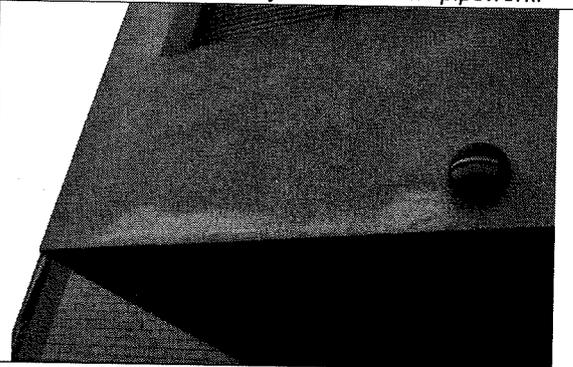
render repairs on the outside face of the balcony, suspect there was flooding of the balcony caused by blocked stormwater pipes.
